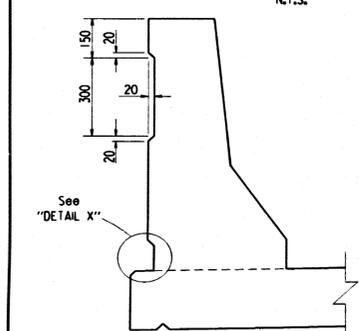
DETAILS OF OPTIONAL SLIPFORMING OF CONCRETE PARAPET RAIL
